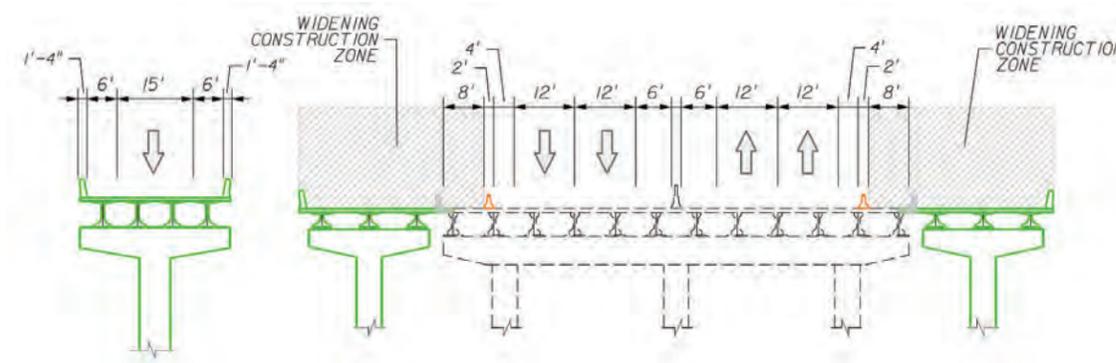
Bridge Over SW 88<sup>th</sup> Street/Kendall Drive - Outside Widening
